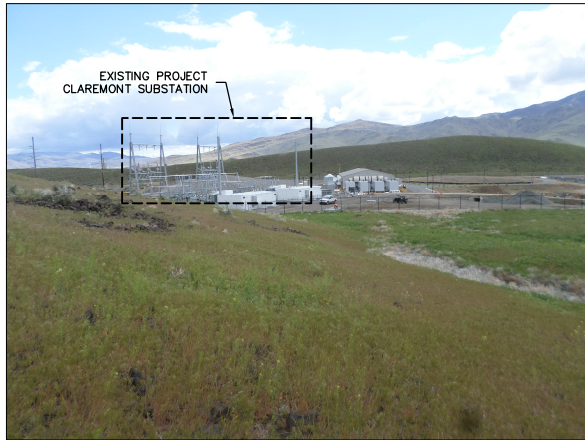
NORTHERN HILLSIDE LOOKING SOUTHEAST.
